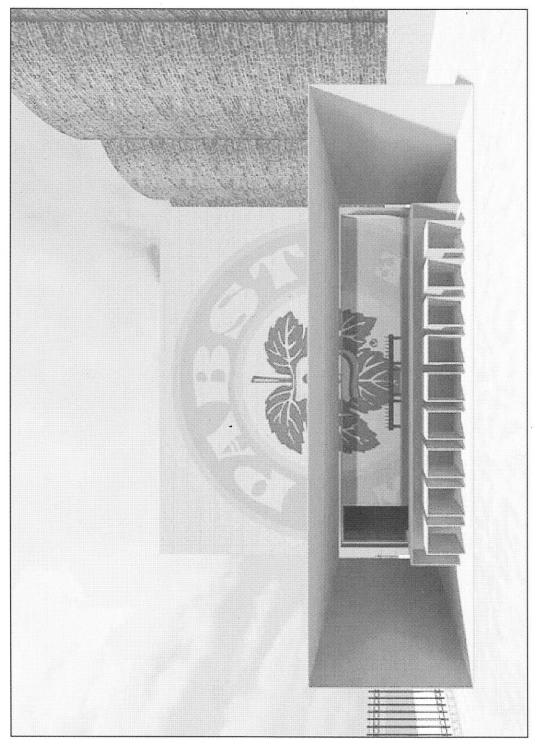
OPTION A - Revised south addition design with <u>sealed wood</u> bar enclosure.
